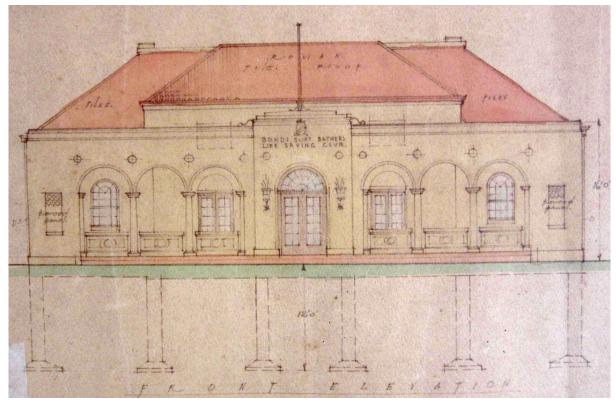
The revised scheme for the new club house. This is the design built with a pitched roof concealing the upper floor walls and the flat roofs. Note the differing location of the doors flanking the front door. The door location as built was between these two drawings. Note the deep foundation piers shown in both drawings. Source: WC LSC Index No 432618 and 432716. Plan Cabinet 786 and 990
